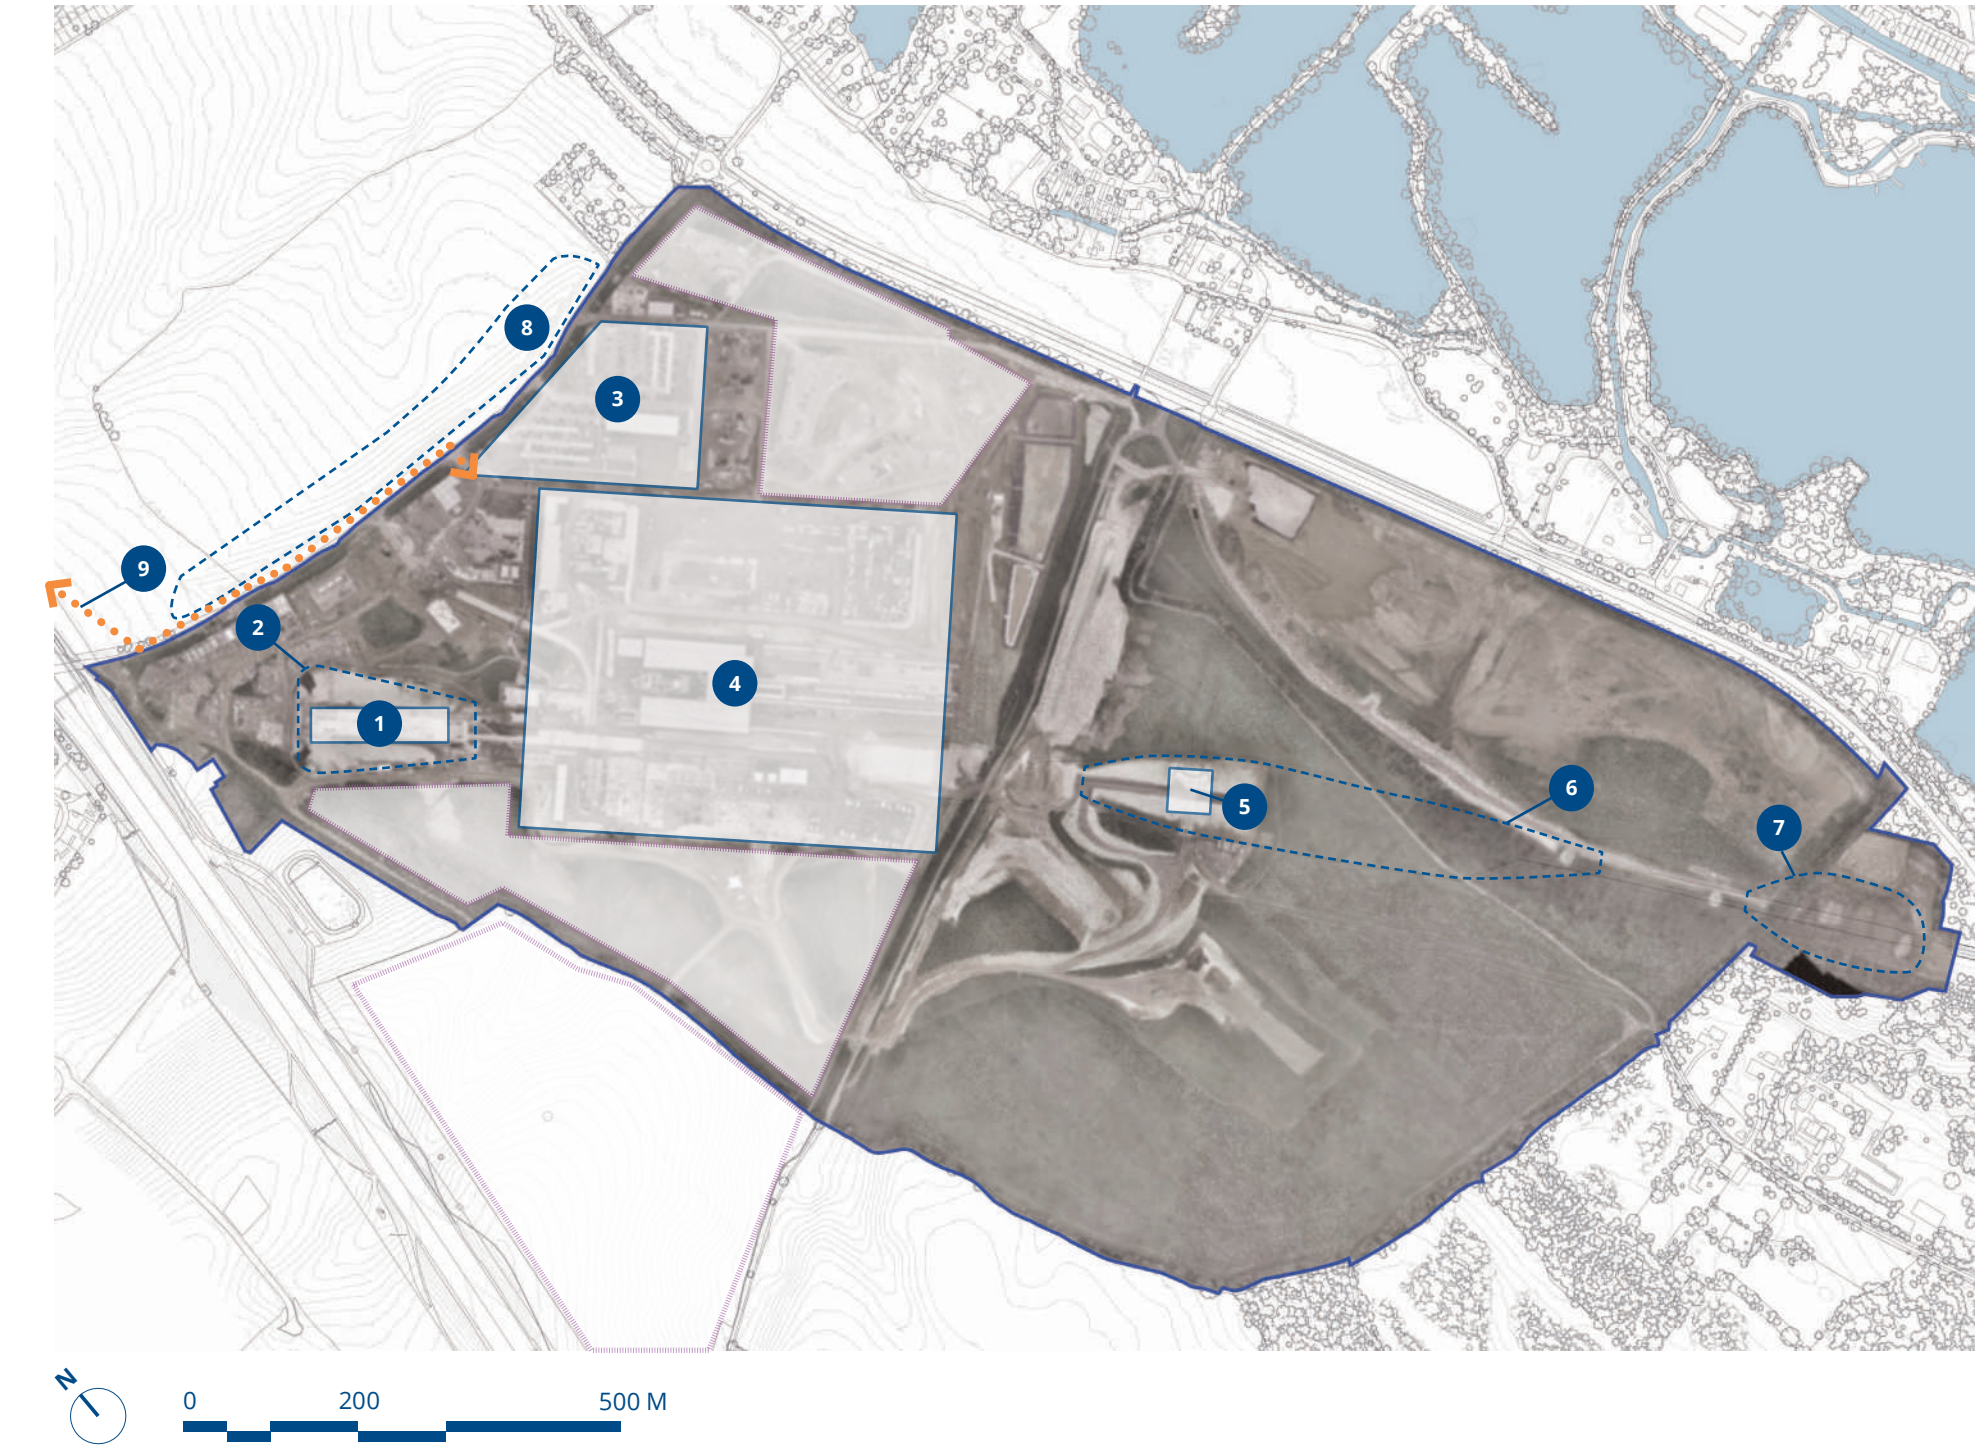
\_ Aerial photography - Compound Zero construction site (December 2020)
